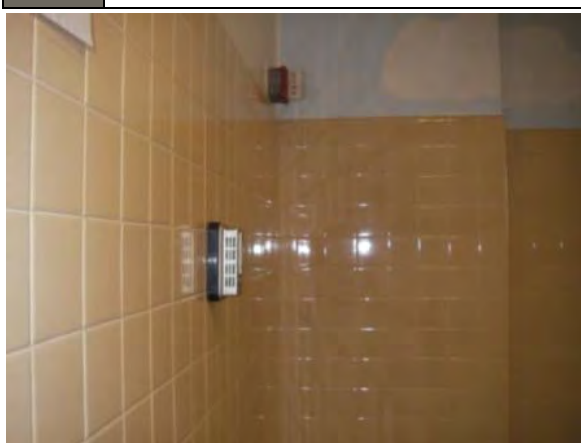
1902 BUILDING BOY'S RESTROOM WITH FIRE ALARM AND THERMOSTAT
